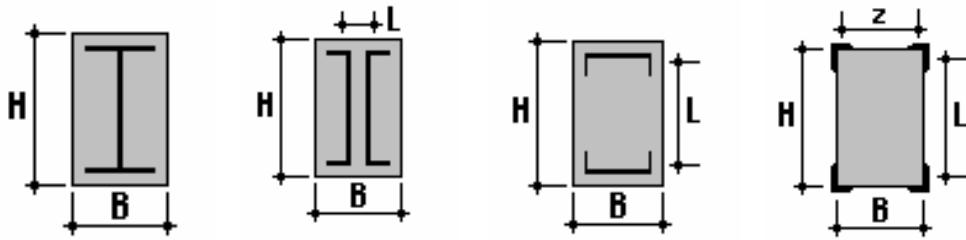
Cross-section types of steel concrete structures which could be calculated on the "ESPRI" program
